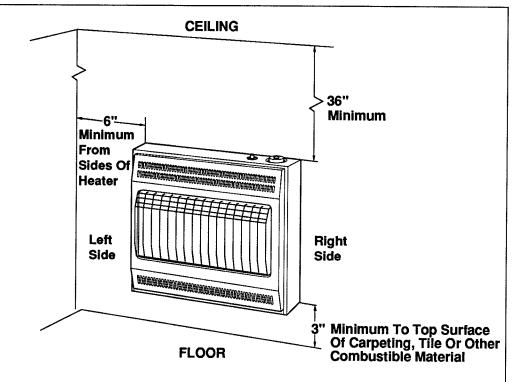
Mounting Clearances As Viewed From Front of Heater
